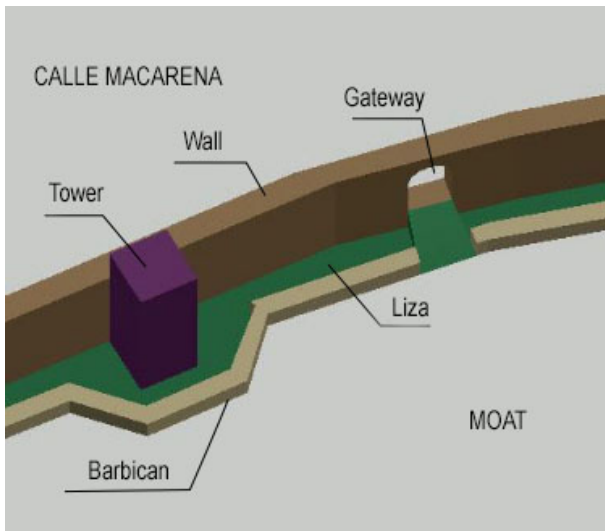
Section of the wall on which the survey is carried out (Source: the authors).
